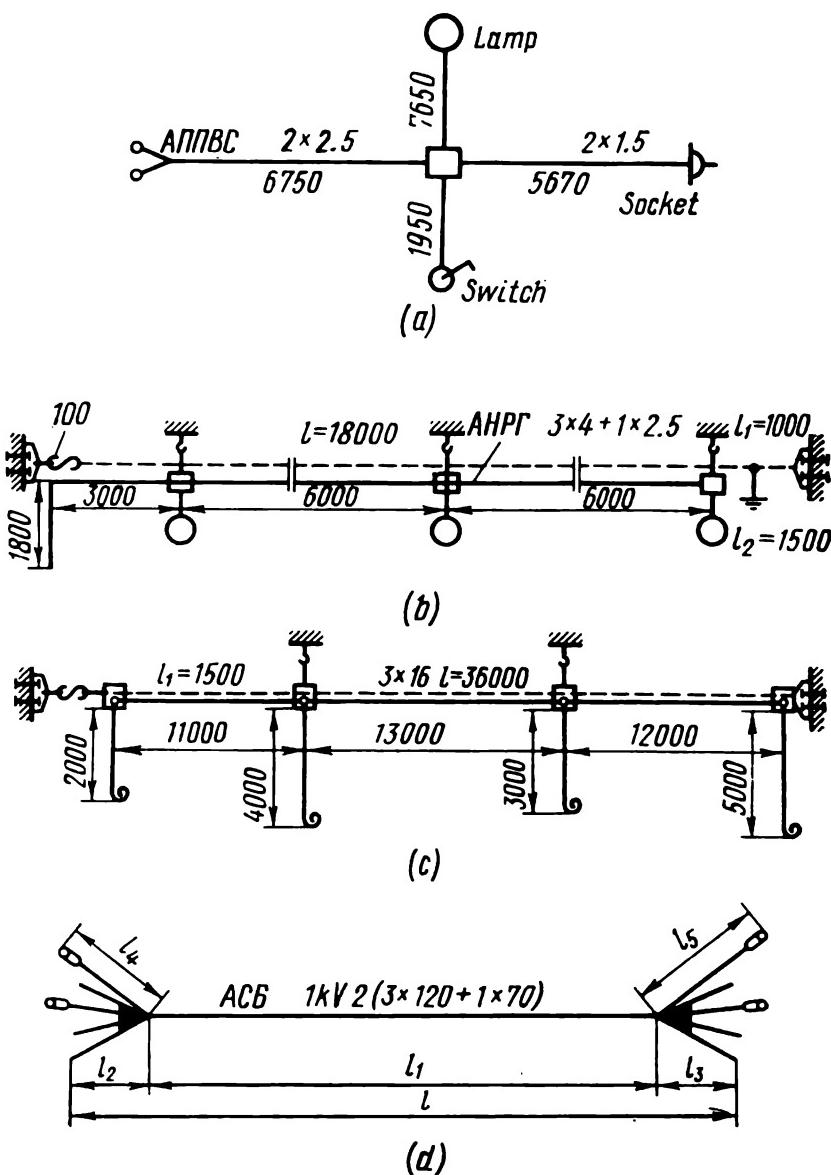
Drawing dimensional sketches for lighting wiring systems
